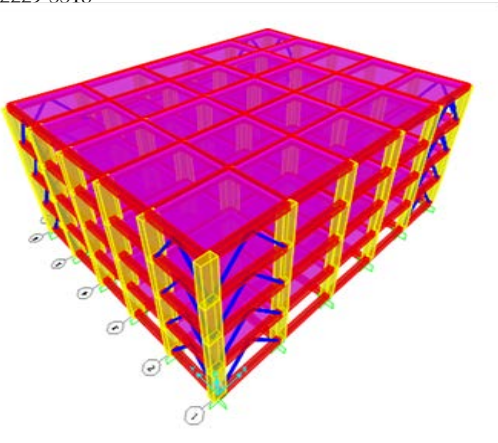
Model 1B of Building with BRB (inverted V) at corner location
